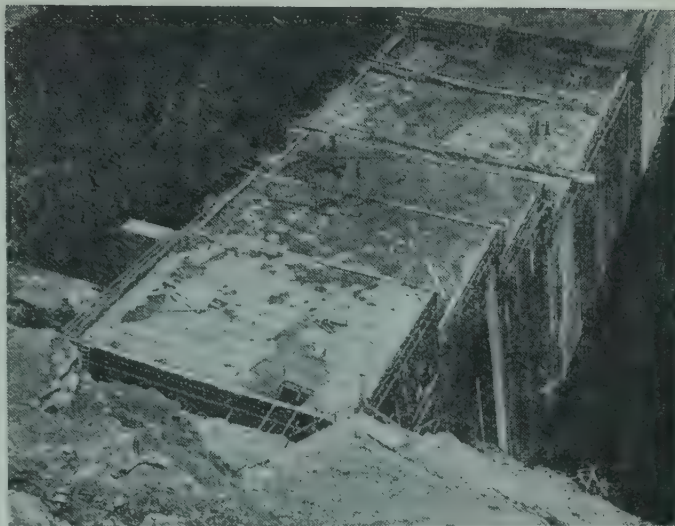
Tubing for Cooling Water on Norfolk Dam.
